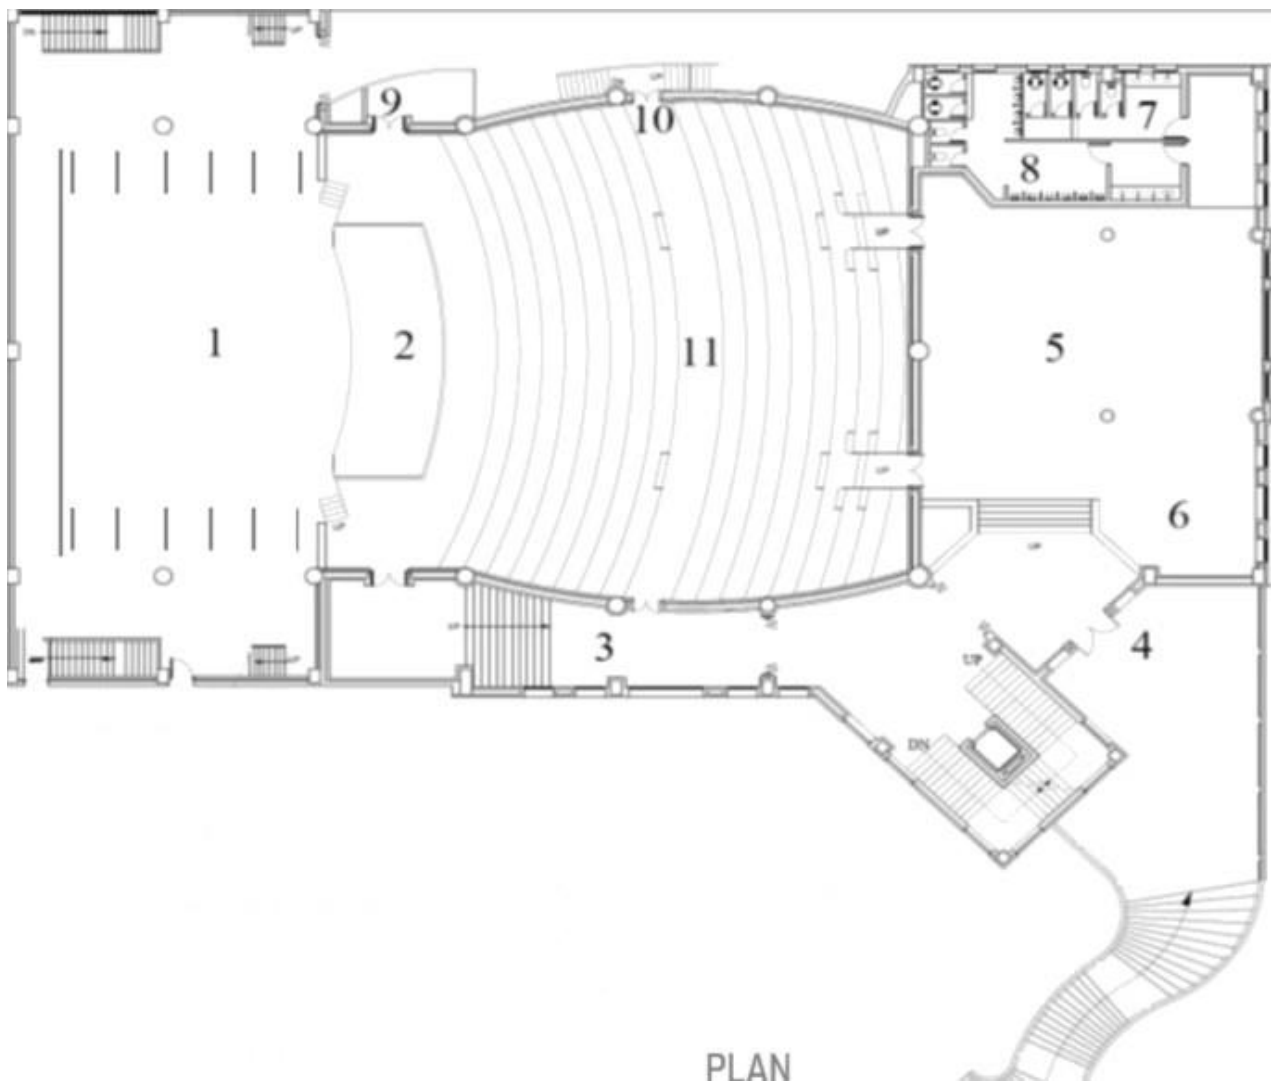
First Floor Plan of Rastriya Nach Ghar
